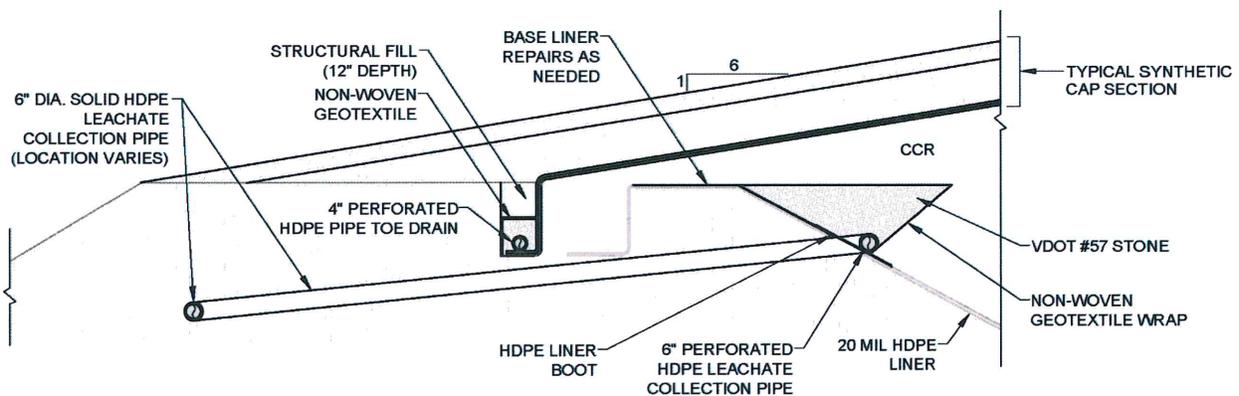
Leachate Collection Pipe at Landfill Perimeter
